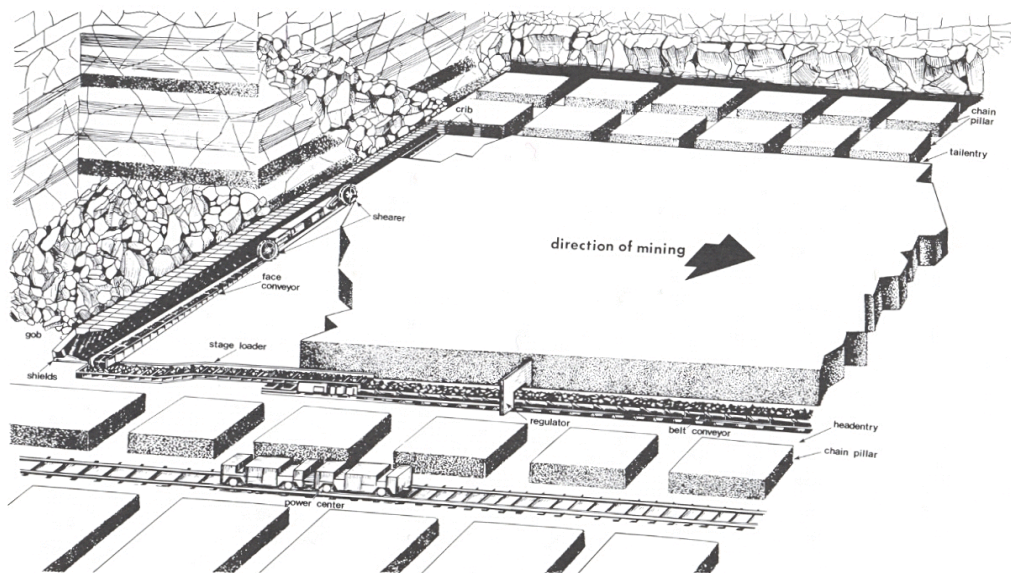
Typical longwall retreat lay-out (Atlas Copco, 1997).
